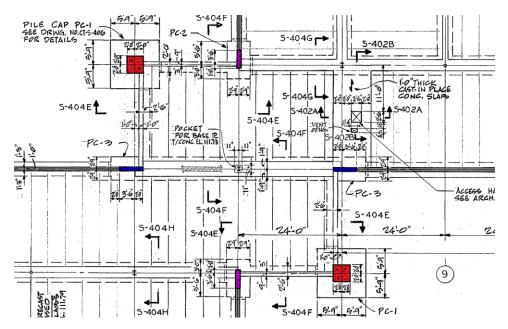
The Pop-Up Structure Connection to the Admin and Lab Buildings
